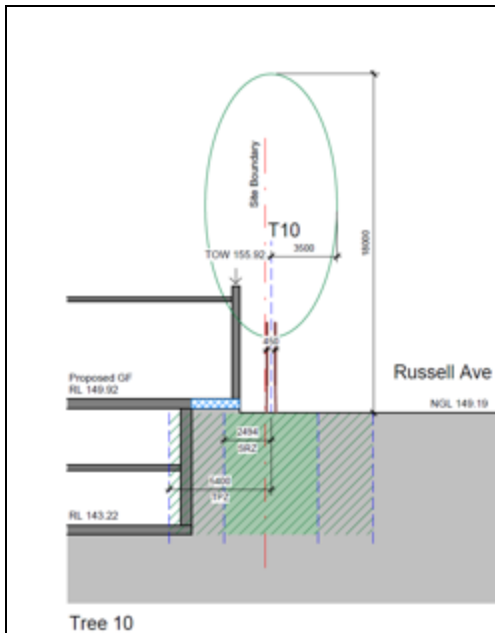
Cross section Tree 10 – construction works including a suspended slab (couter level) retain existing soil level. TPZ Incursion of 5.9%.
